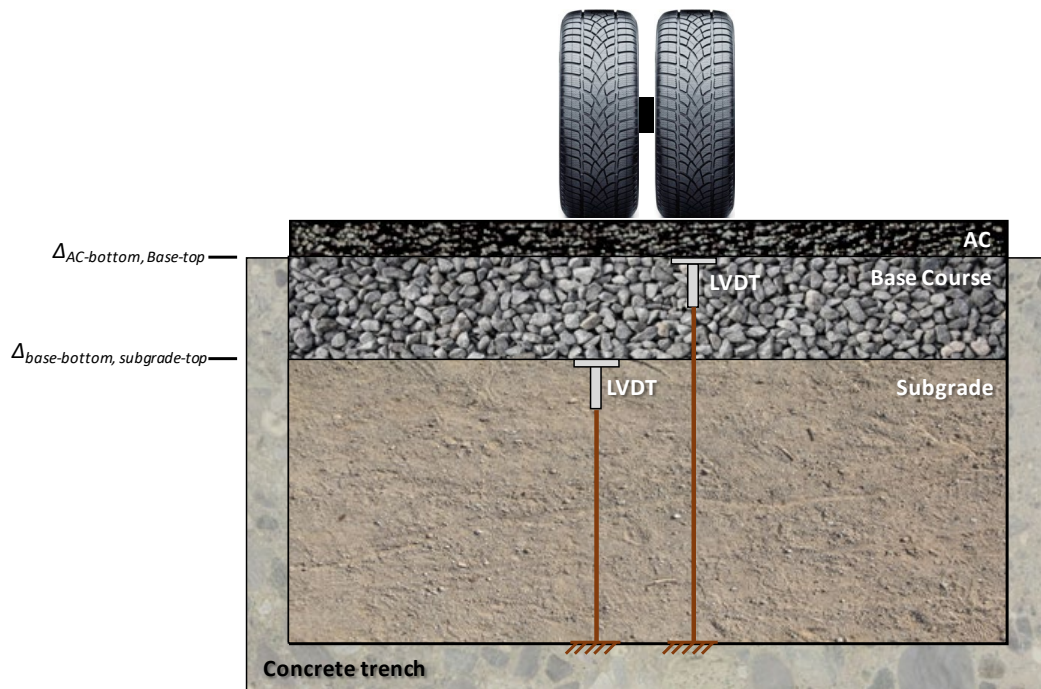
Cross-section of LVDT installation in the subgrade and base course.
